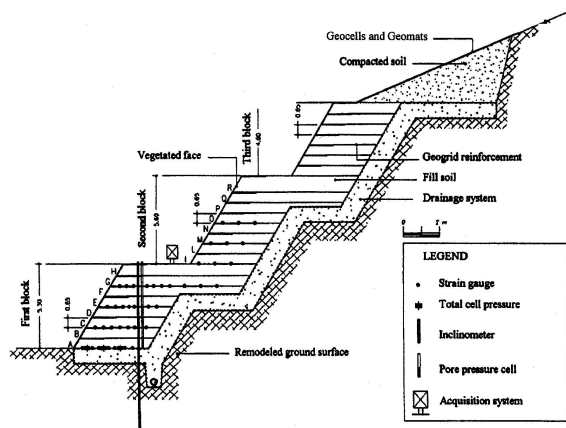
Cross-section of the instrumented reinforced soil slope (Ghinelli and Sacchetti 1998).
